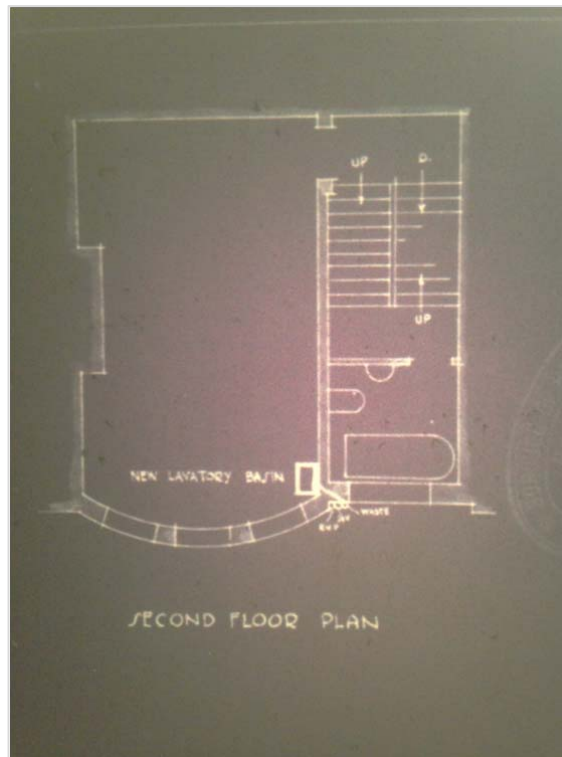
1925 Drainage Plan (Second Floor Rear Room)²⁸
